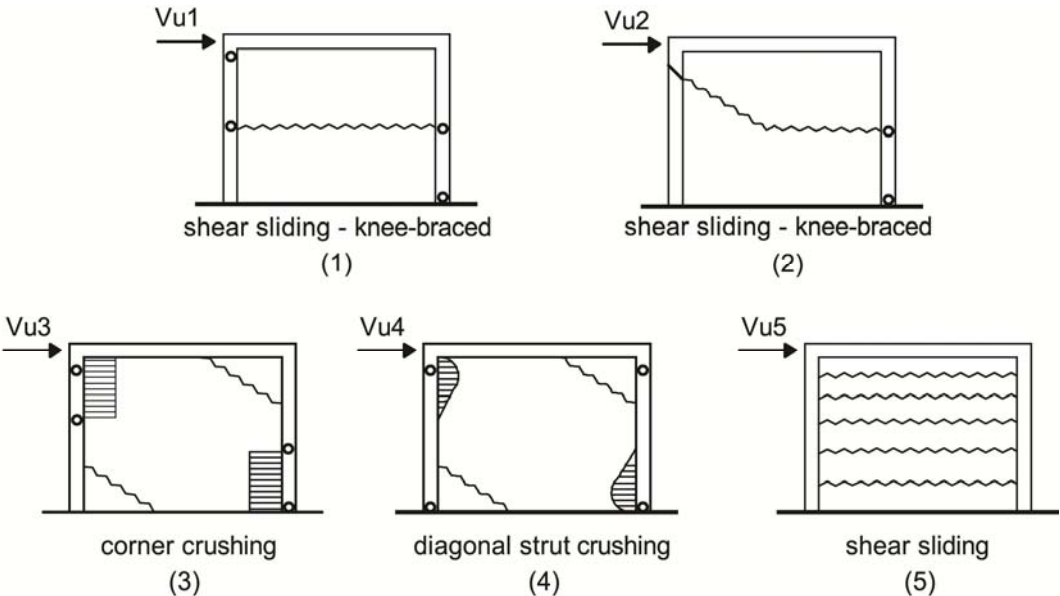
Suggested modes of failure of a masonry infilled RC frame (Shing and Mehrabi, 2002)
